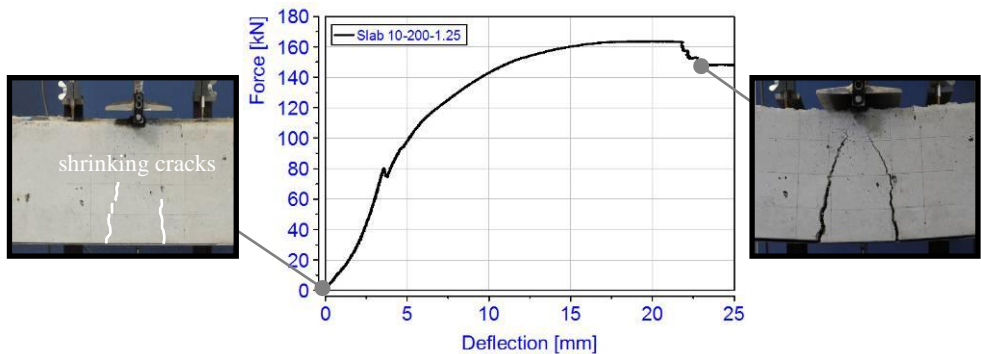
Crack pattern due to shrinking and crack evaluation due to loading
